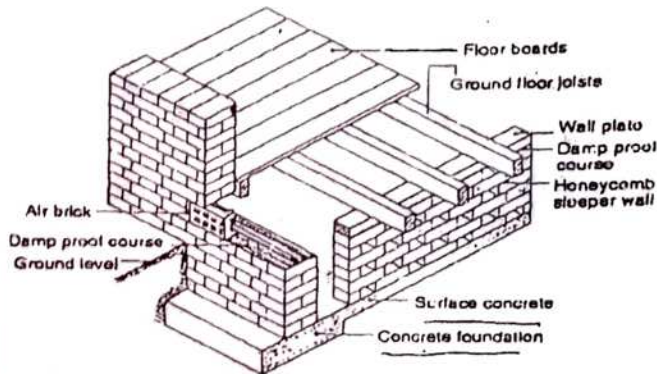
SUSPENDED TIMBER GROUND FLOOR
